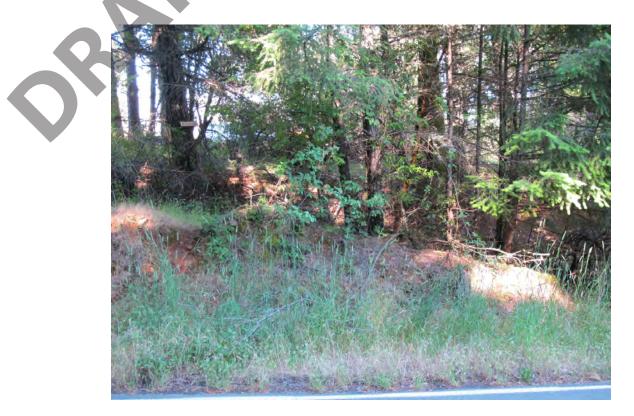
Looking east at ditch and exposed intensely weathered rock on east side of Sherwood Road immediately north of tie-in.
